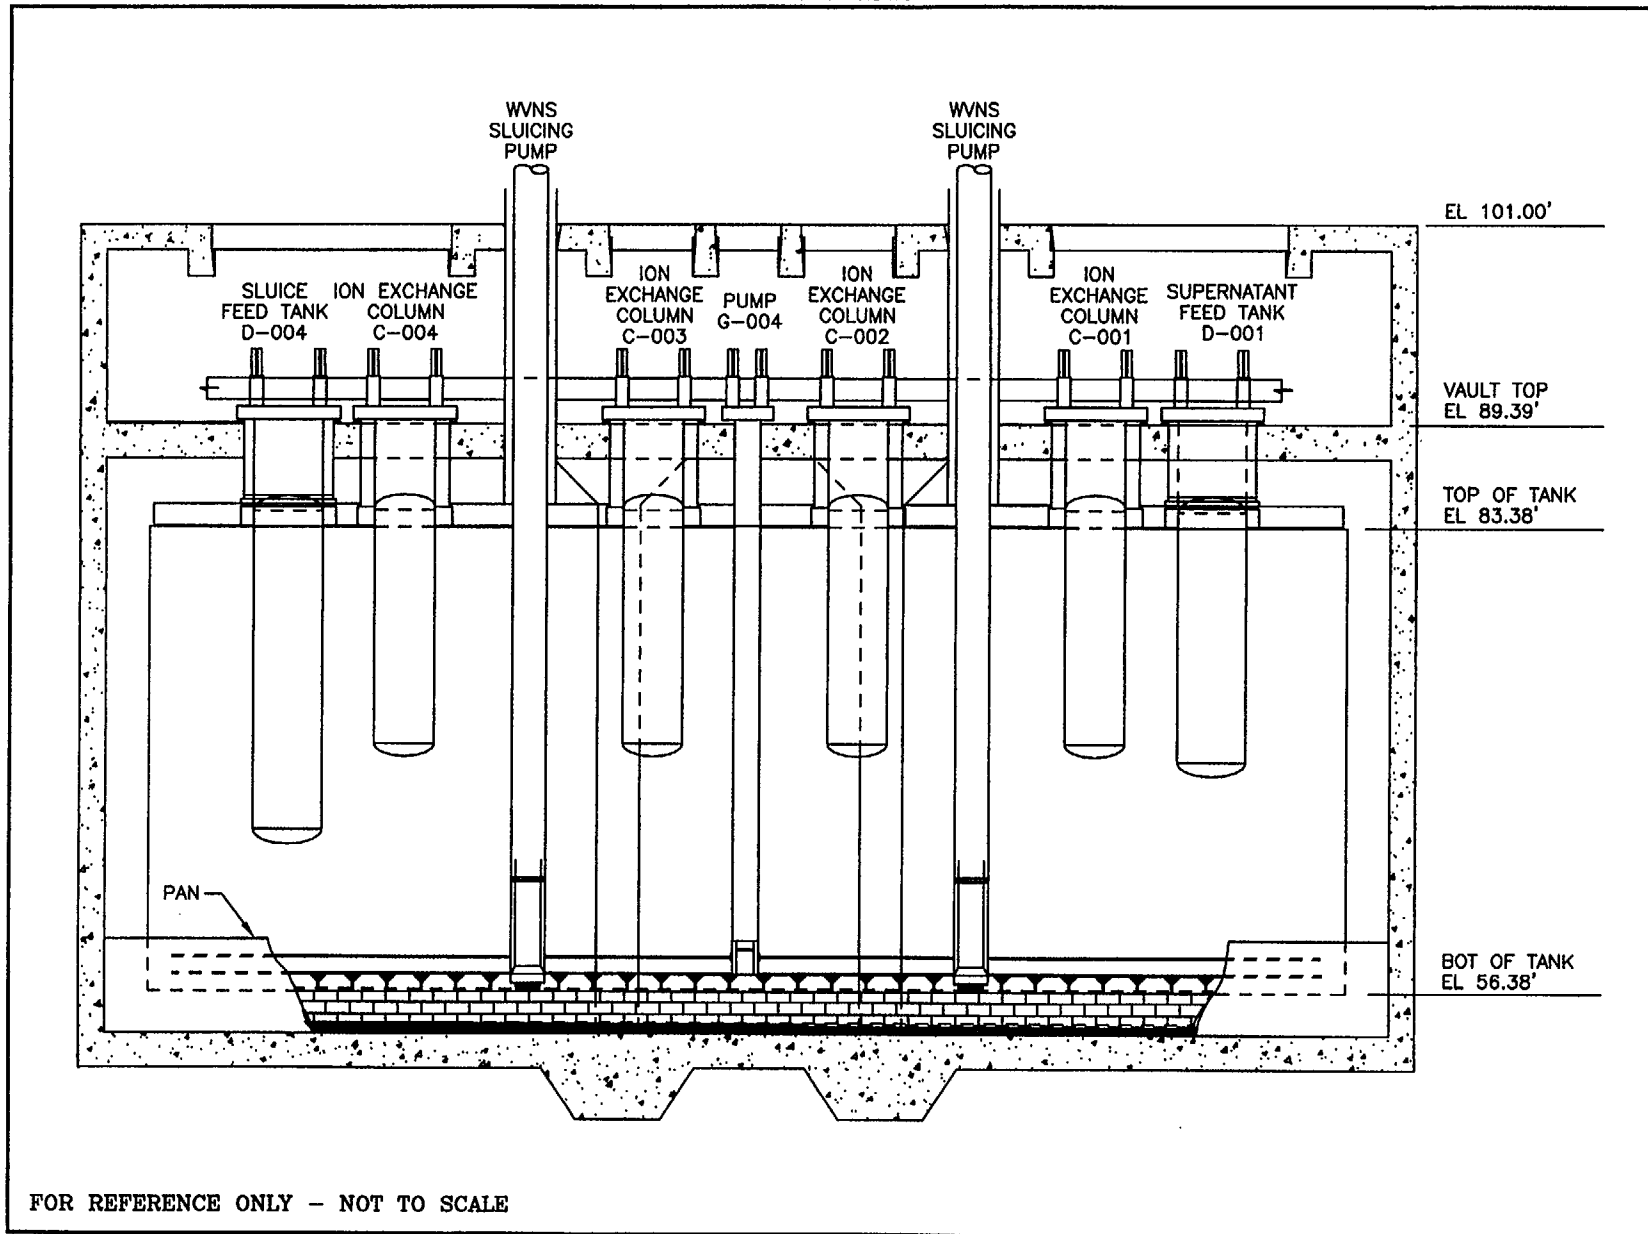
General Arrangement - STS Tank 8D-1 Section
